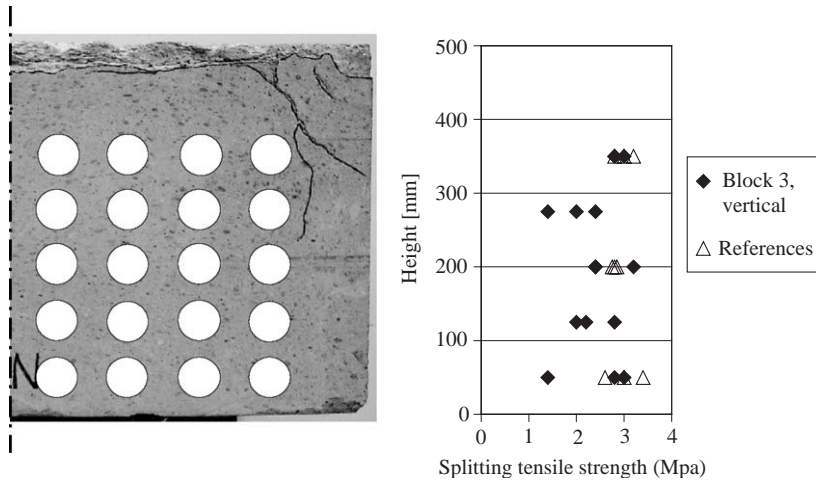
Uniaxial splitting tensile tests, horizontally drilled cylinders, block three.
